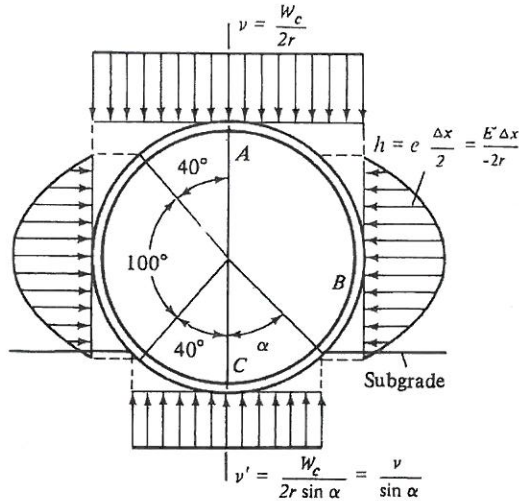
Assumed distribution of pressure on flexible culvert pipe.
